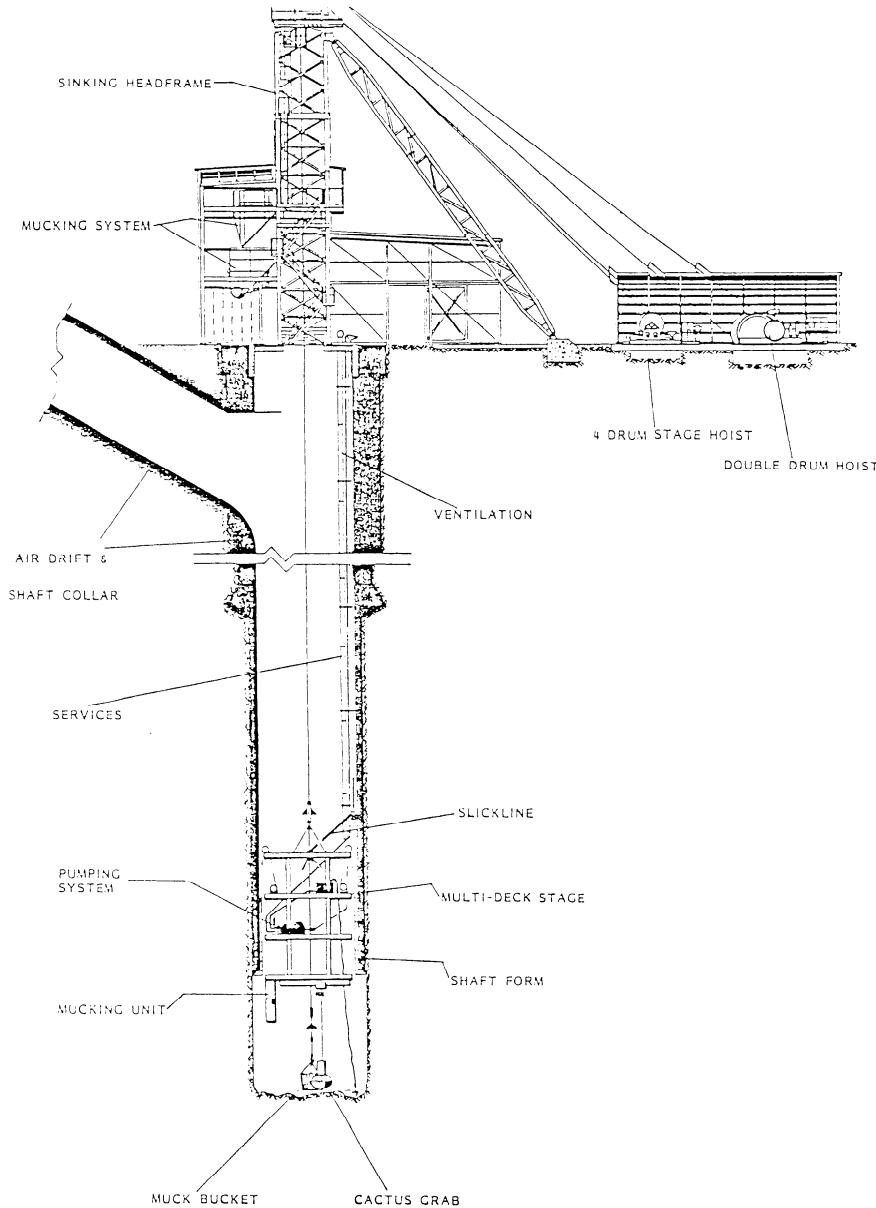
Typical shaft sinking arrangement. (After Hynd, 1982.)
